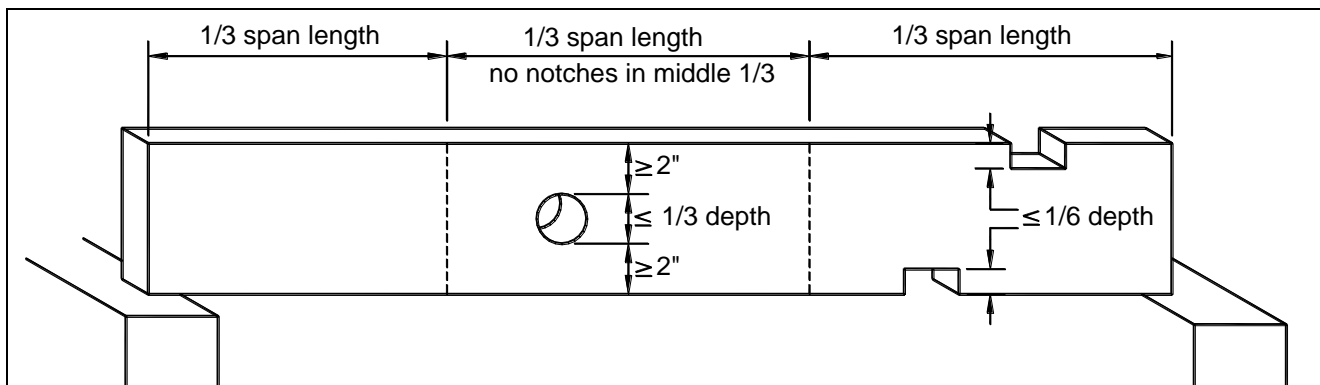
DRILLING AND NOTCHING OF JOISTS
